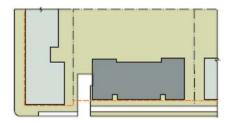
street setbacks consistent with the existing established building alignments.
